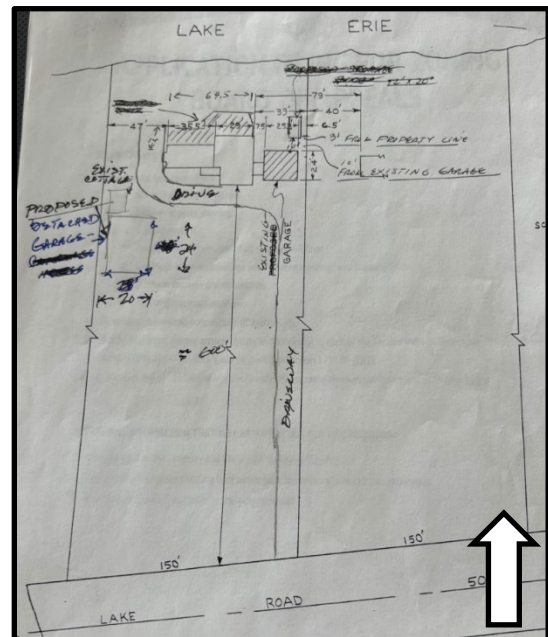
Site Plan – Applicant Provided (CAV 24-25)
